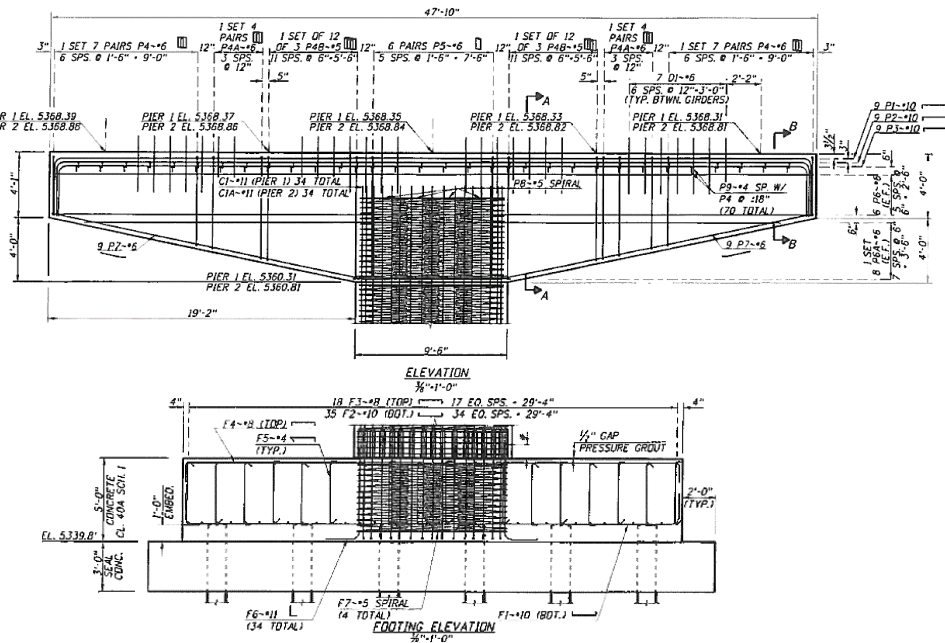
Salmon River Bridge Column Cap, Column, and Footing Elevation Views (NTS)
